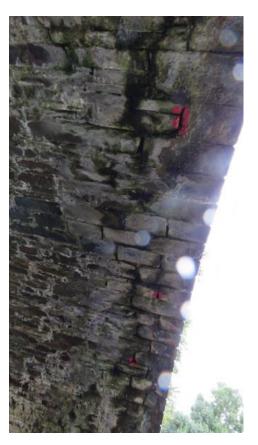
Duncannon Bridge – 3 crevices marked behind facing stones
